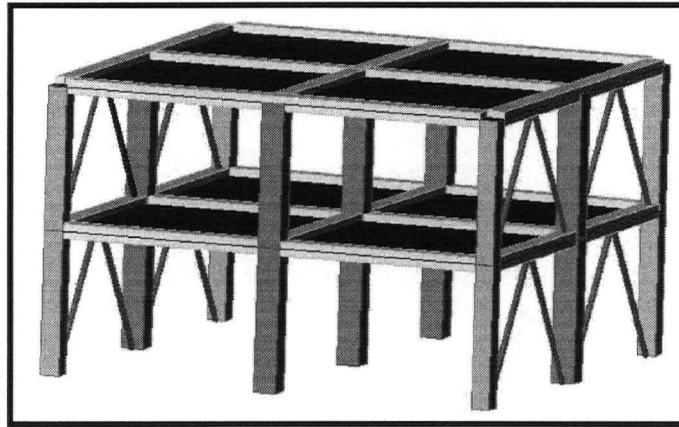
1 A 3D view of the structure under consideration with the proposed bracings installed.
